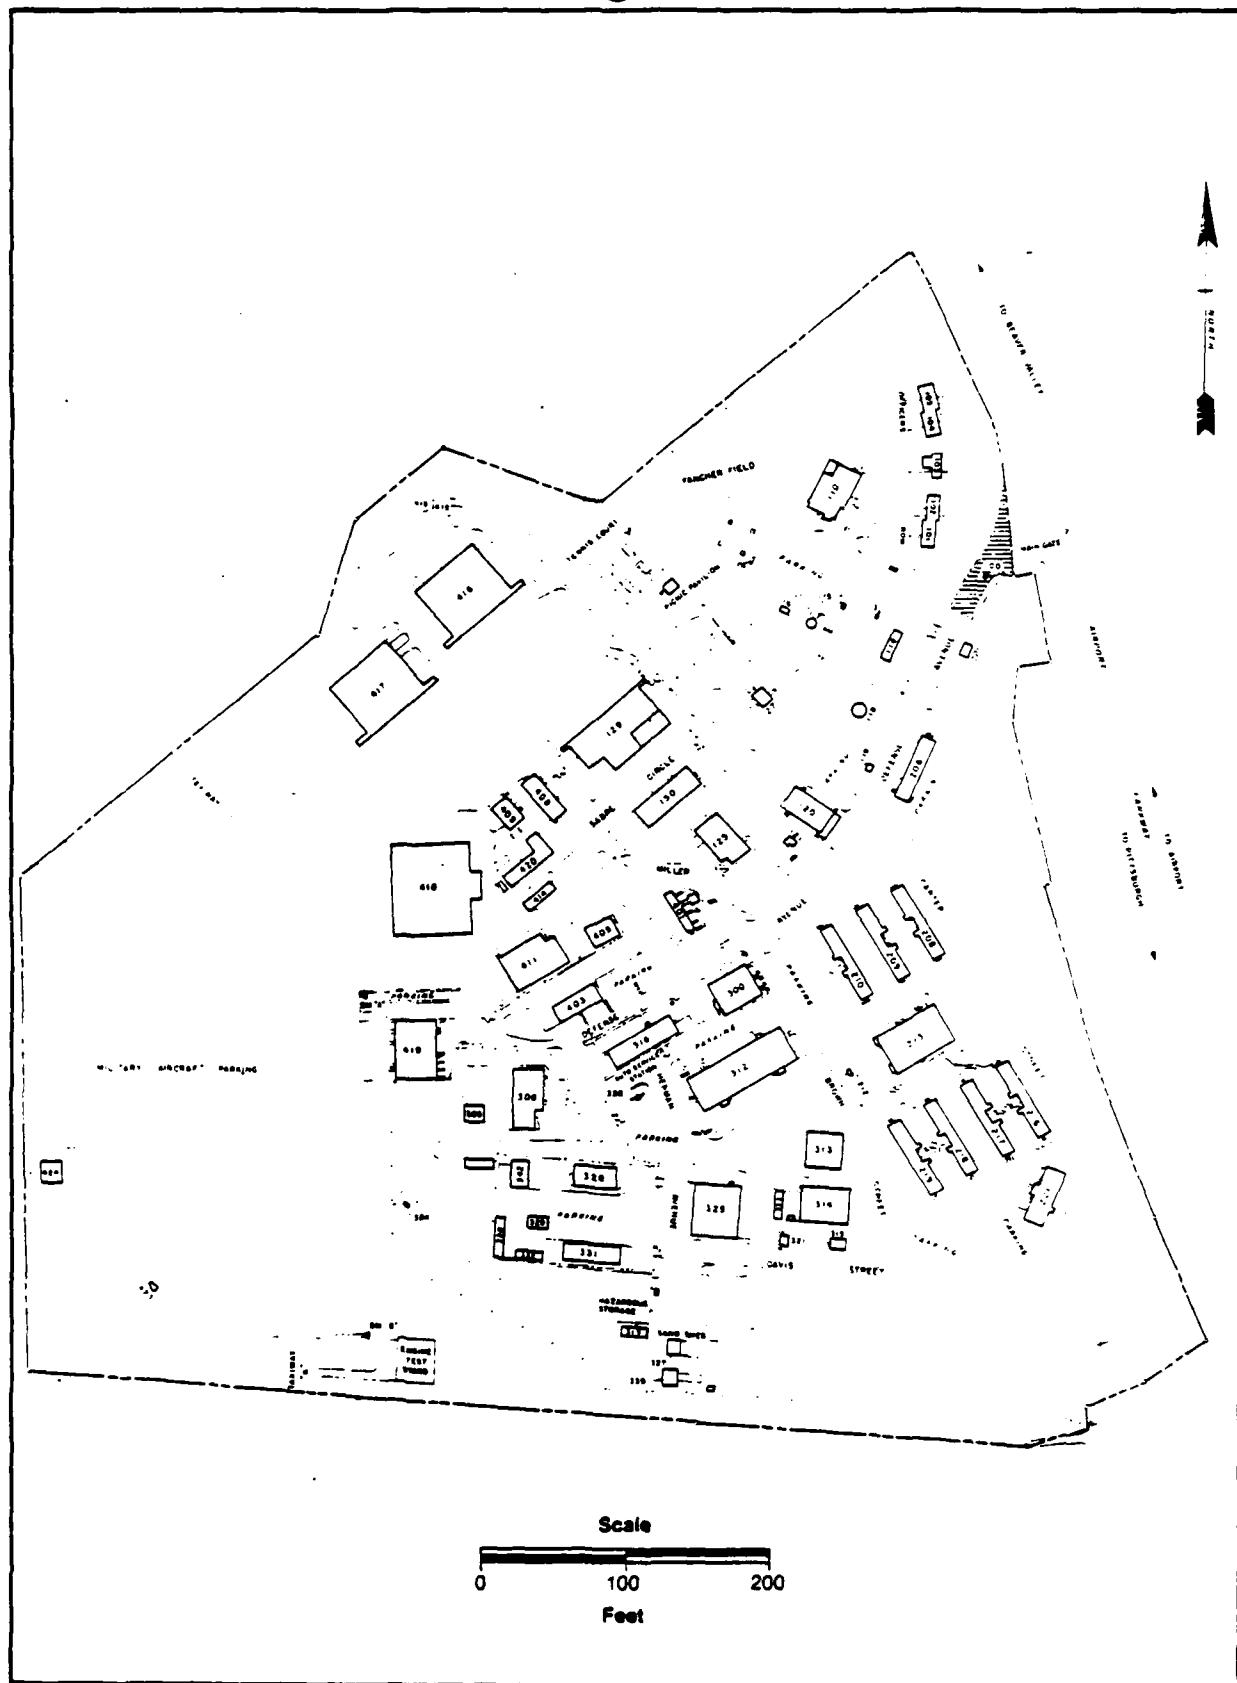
U.S. AIR FORCE RESERVES - 911TH TAG FACILITY LAYOUT
